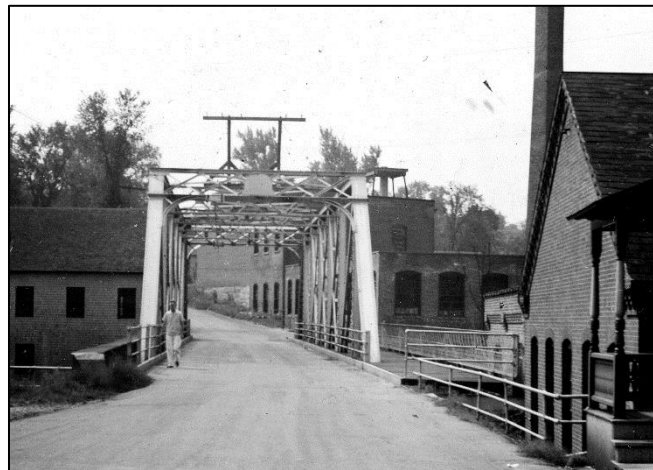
Plains Road Bridge over Sugar River in West Claremont, a single 131' span Pratt thru truss built 1906, replaced 1974. This is probably the first highway bridge designed by John Storrs after establishing his consulting business in 1905. Built by United Construction Company, Albany, NY. Photo taken August 26, 1942. Note utility lines carried on wood tower mounted atop the bridge (NHDOT Bridge Inventory Card, Claremont 091/118).
